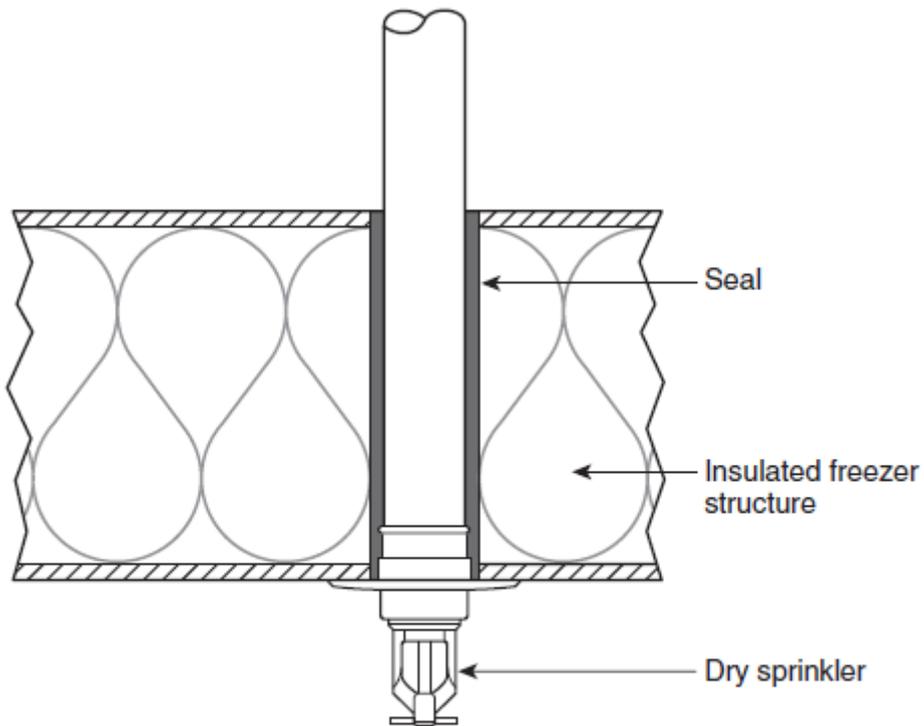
(b) Dry Sprinkler Seal Arrangement — Seal Within Freezer Structure.
